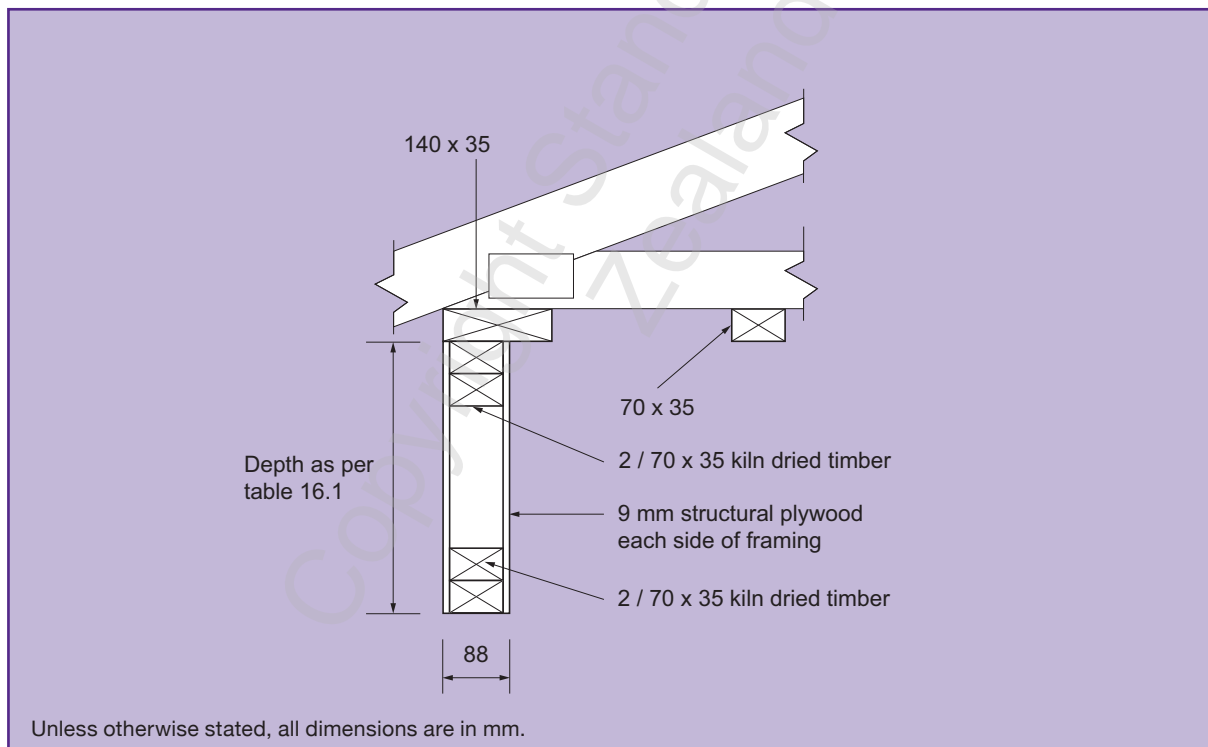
Built-up plywood box beam lintel – Vertical section (see 8.6.1.7)
